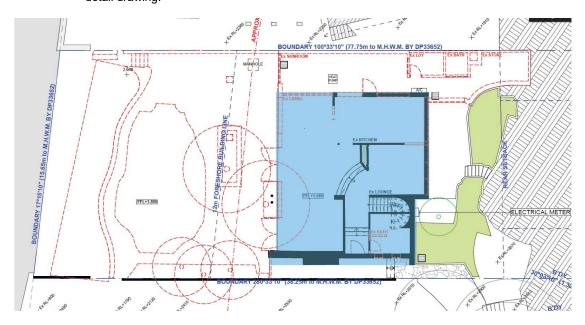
No demolition is to occur in the blue shaded area except as noted above.
